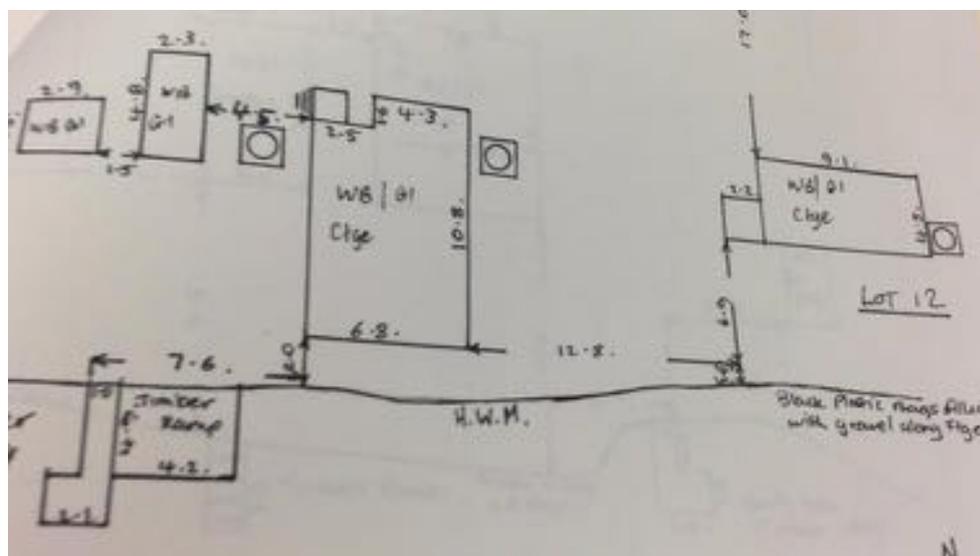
(NSW Department of Industry, Lands & Water Division) diagram of improvements at lot 11 and Lot 12
